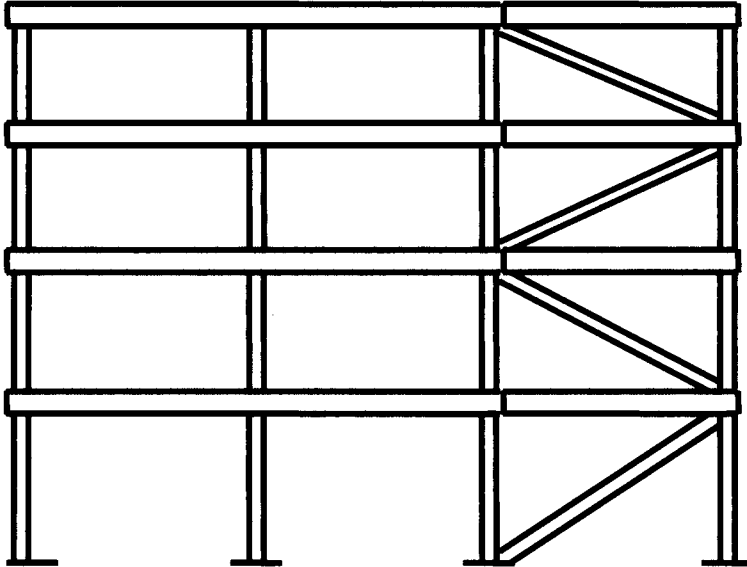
Columns and beams in a typical frame with discontinuous columns
